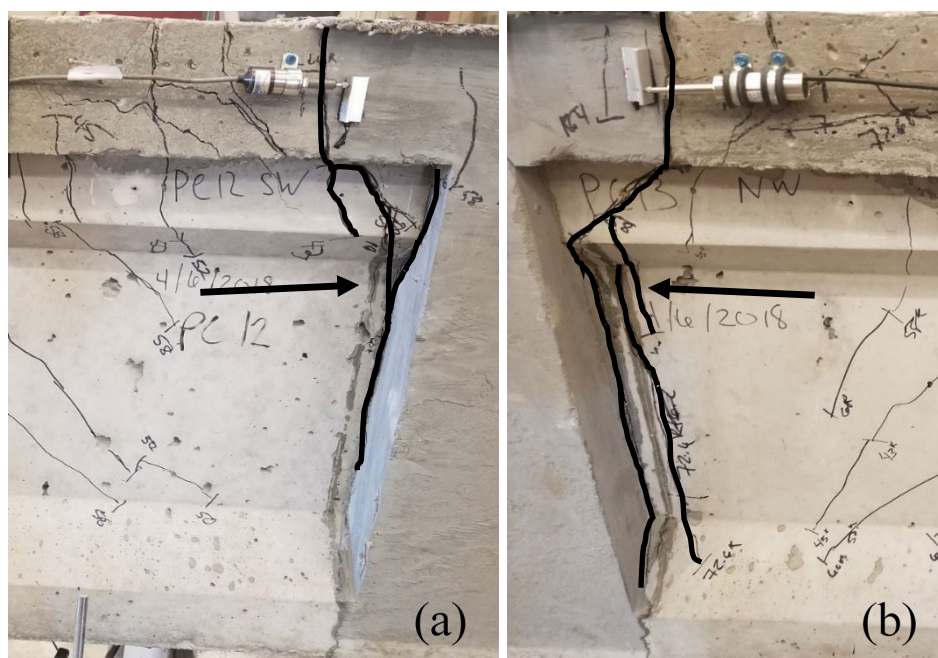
Joint separation at the interface between the NC1-N girder and the UHPC joint (a) and flexural cracking parallel to the interface between the UHPC joint and the NC1-S girder (b) are indicated by dark lines.
